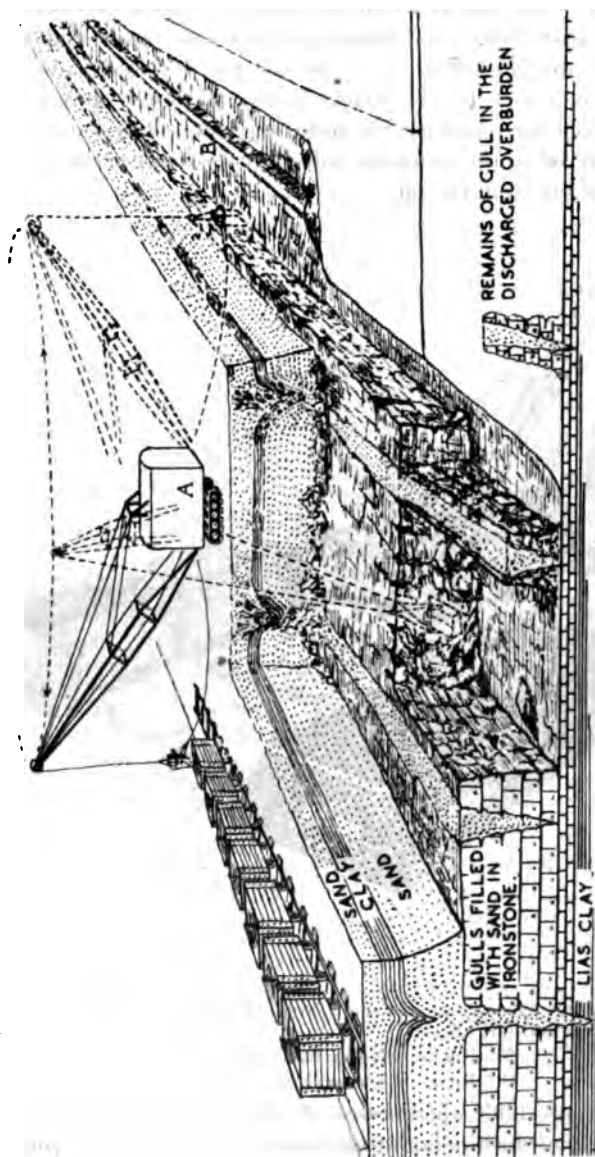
Dragline excavator (A) stripping and levelling overburden and removing and loading ironstone from between gulls (B).
